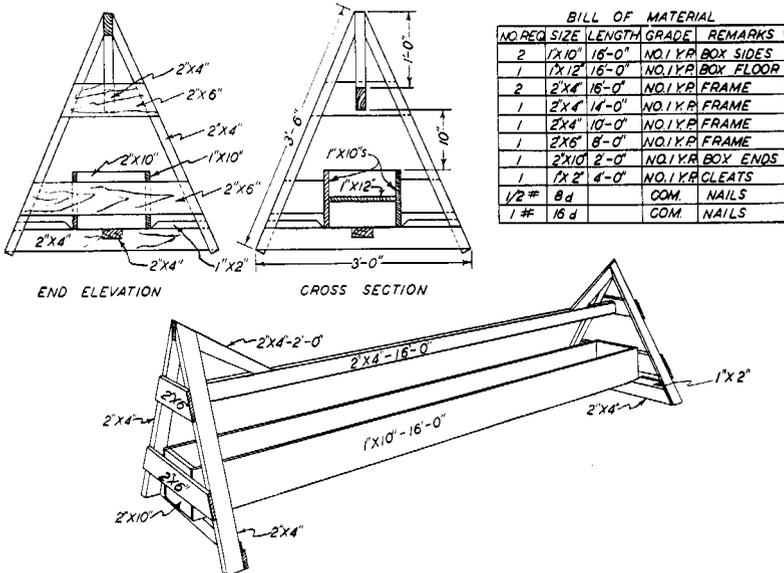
Detail and construction plan of reversible grain trough shown in figure 17.
